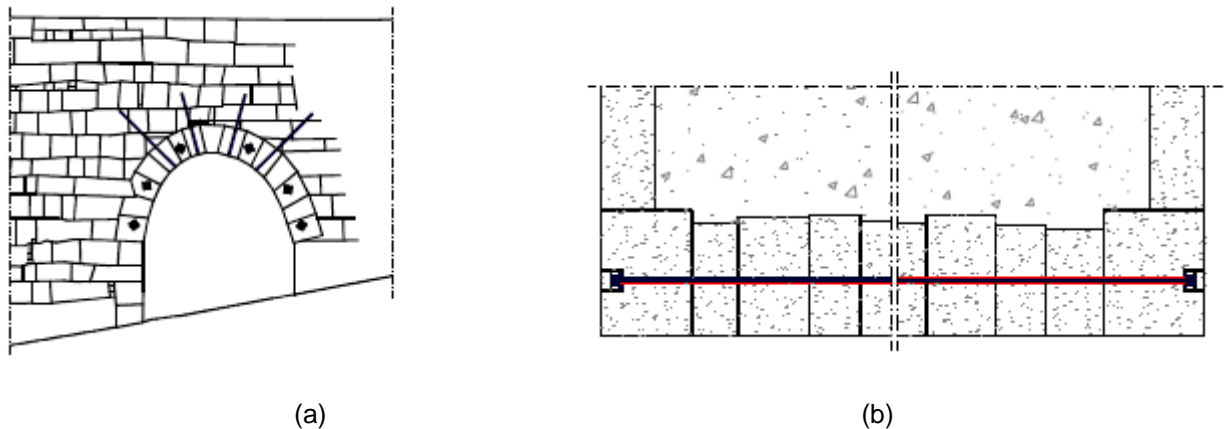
Flood arch strengthening system; (a) anchor scheme; (b) horizontal anchors. (Oliveira, 2004)
